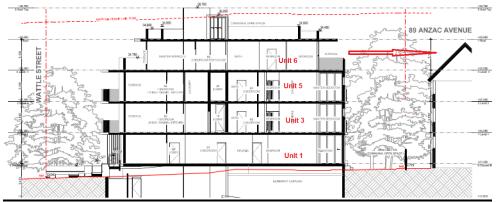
Section of the separation between rear balconies facing 89 Anzac side elevation.
